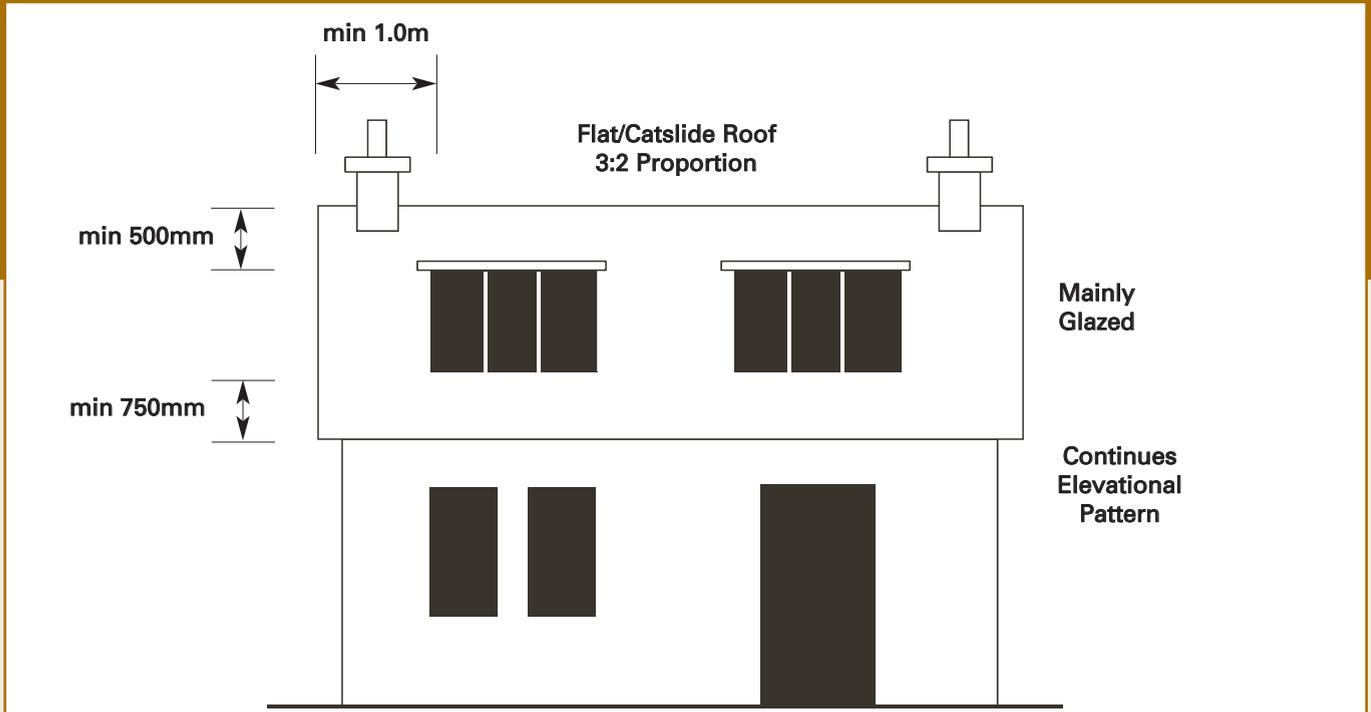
BOX DORMERS - Dimensional/elevational constraints where applicable
